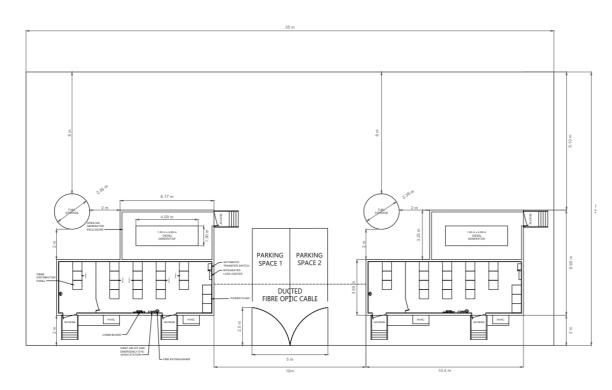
Plan view of ORS site (not to scale). EN020022-000466-2.10 Indicative Optical Regeneration Station Elevations and Floor Plans [REP1-008].
